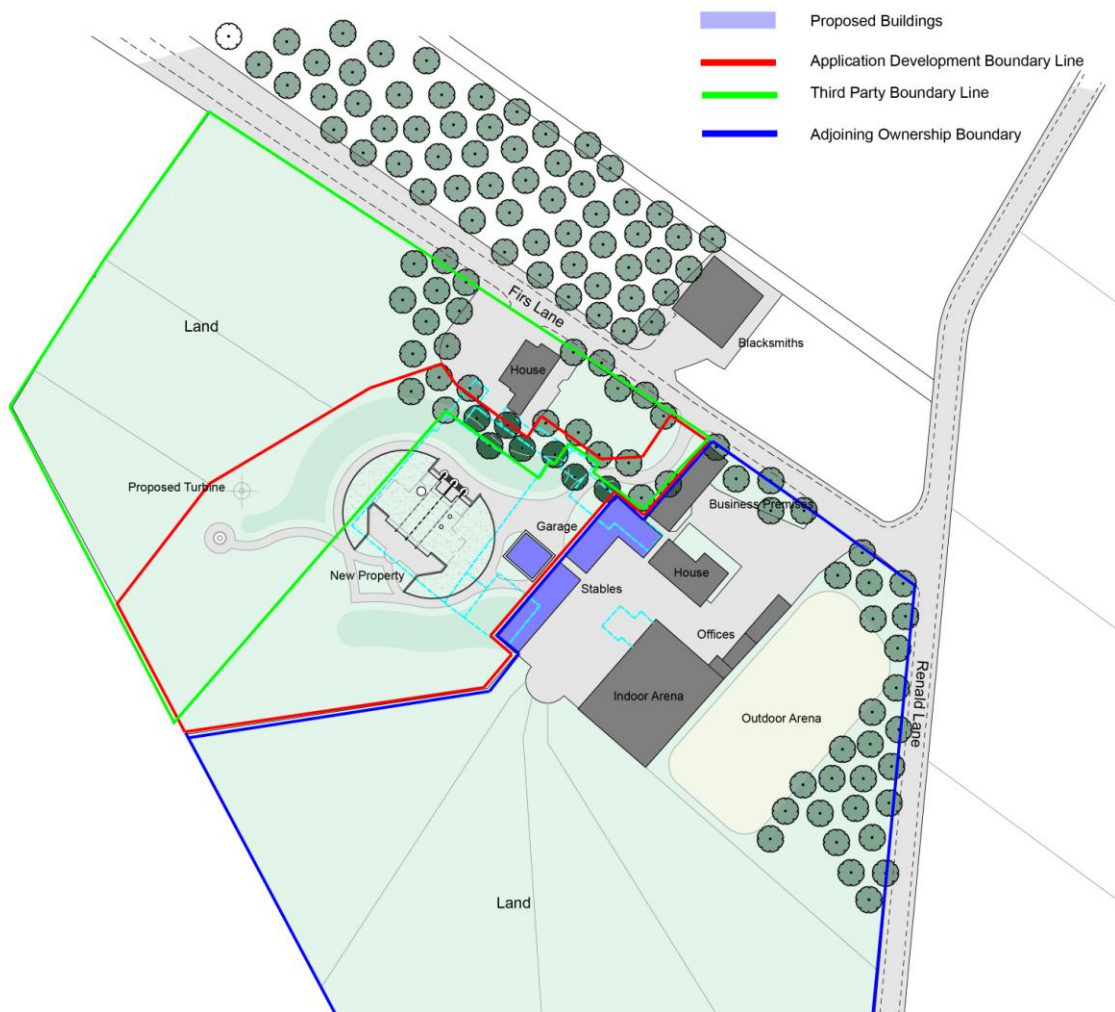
Proposed site plan showing the new dwelling in relation to existing buildings and the possible for addition of new stables making up the Equestrian Centre
